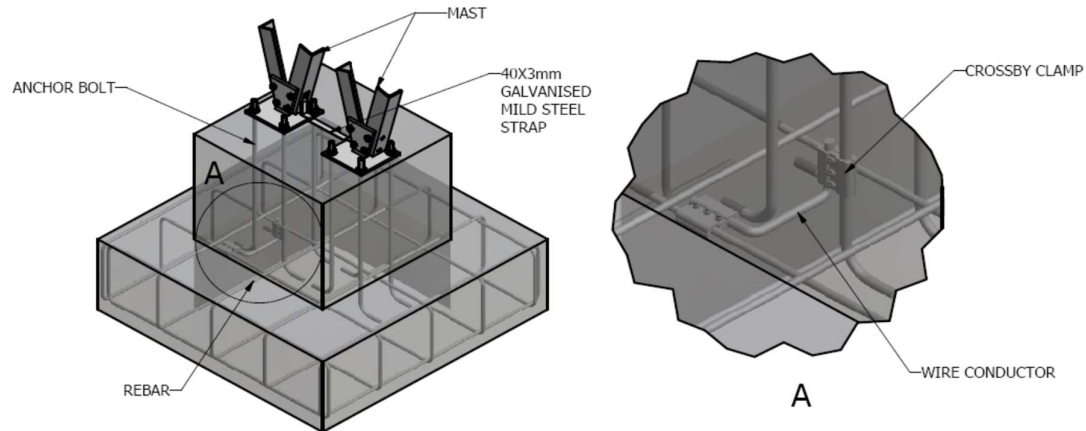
Tower Leg (Guyed Vee) And Rebar Connection
